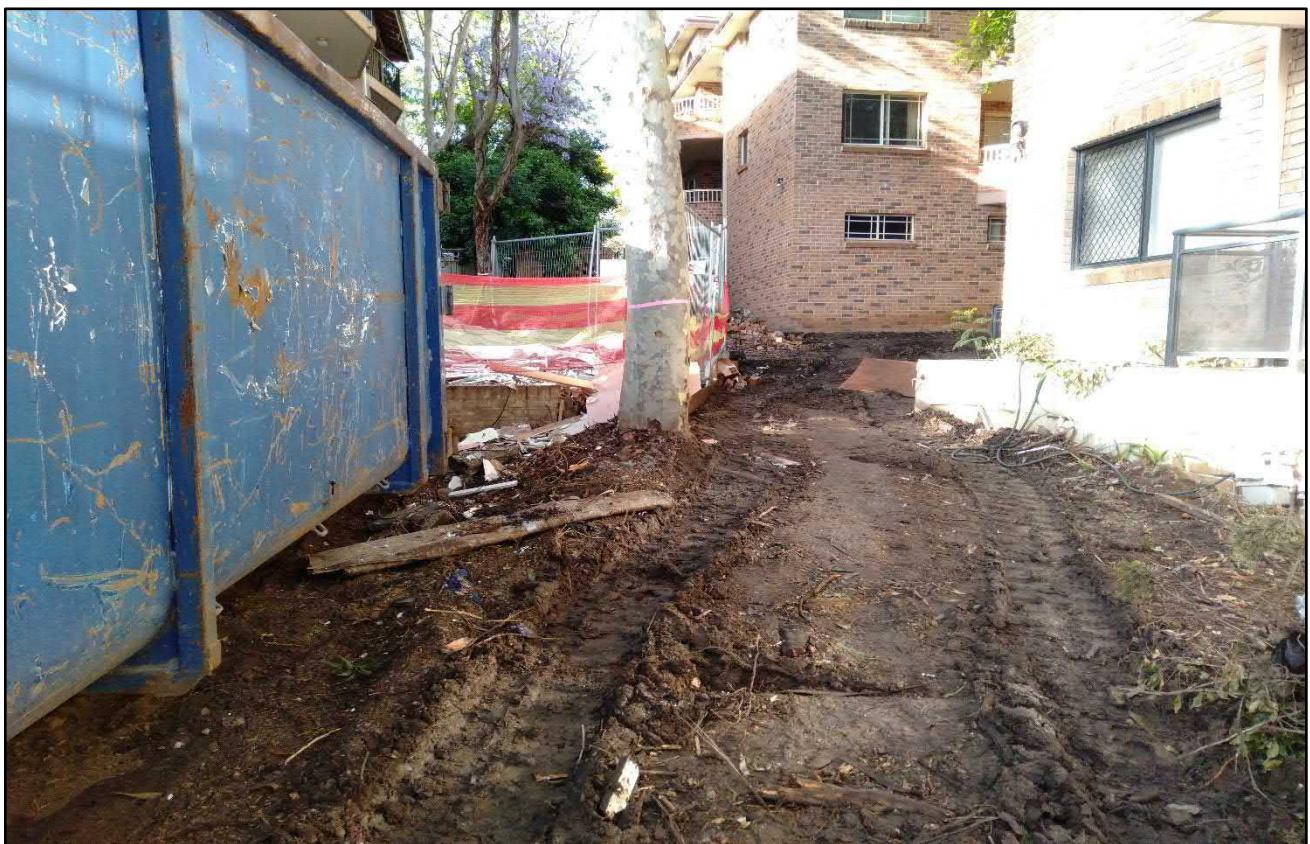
Internal site access restrictions, including asbestos building materials and overgrown vegetation. Date: 12.11.21.
